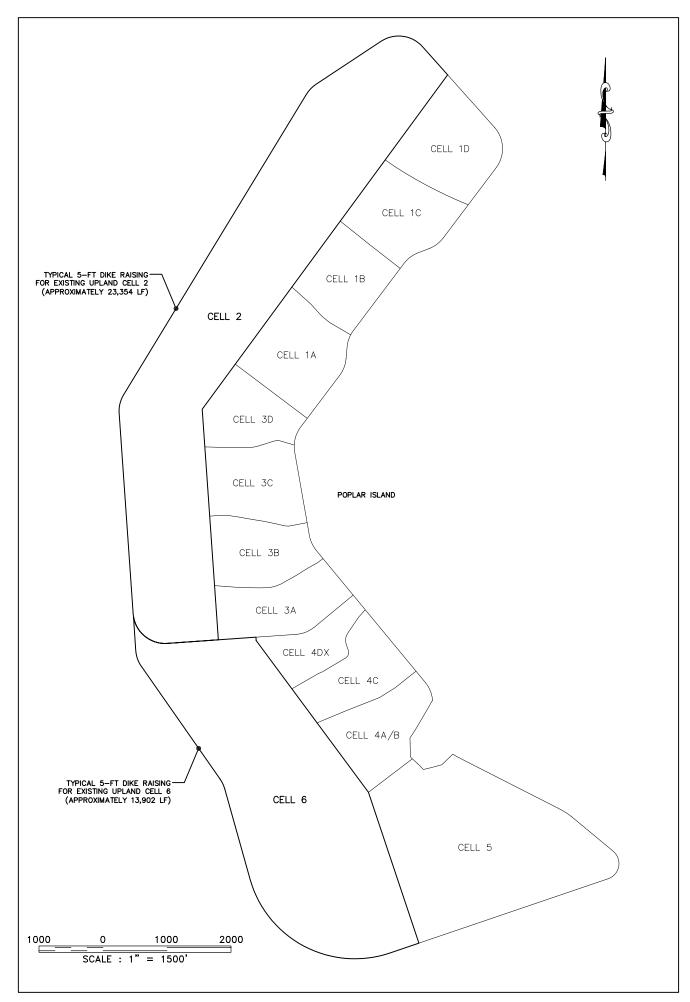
Layout of Typical Section for 5-ft. Dike Raising
